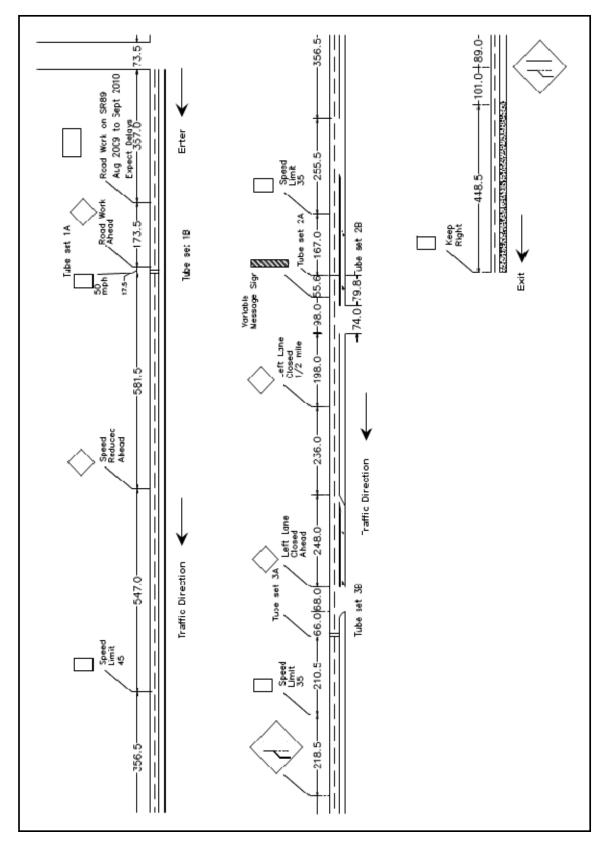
Detailed Layout of Work Site Signage and Distances (ft).
